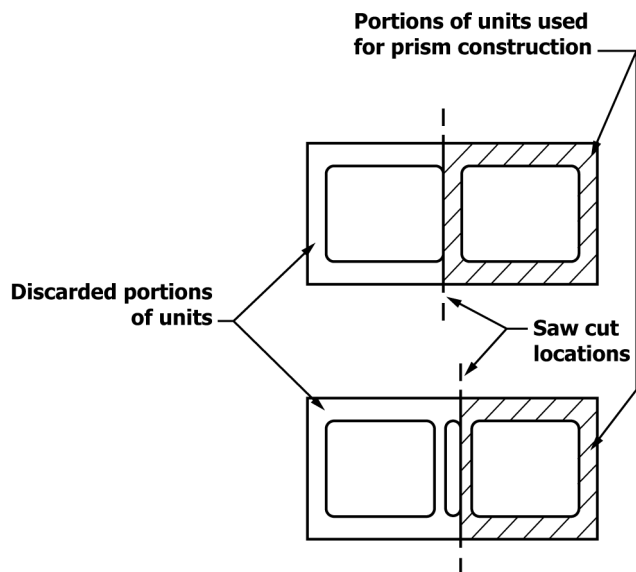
Reduction of Hollow Units Prior to Prism Construction
